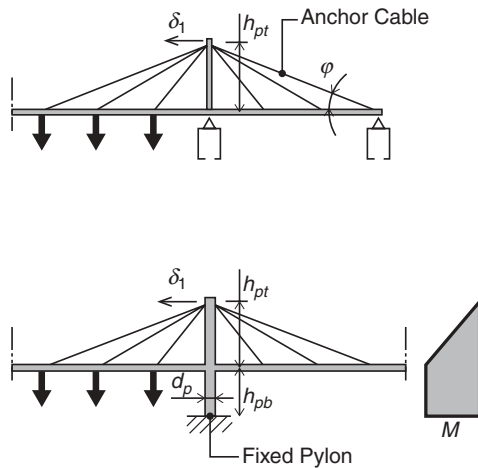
Fan-shaped cable systems supported by two piers (top) or by a fixed pylon (bottom)
